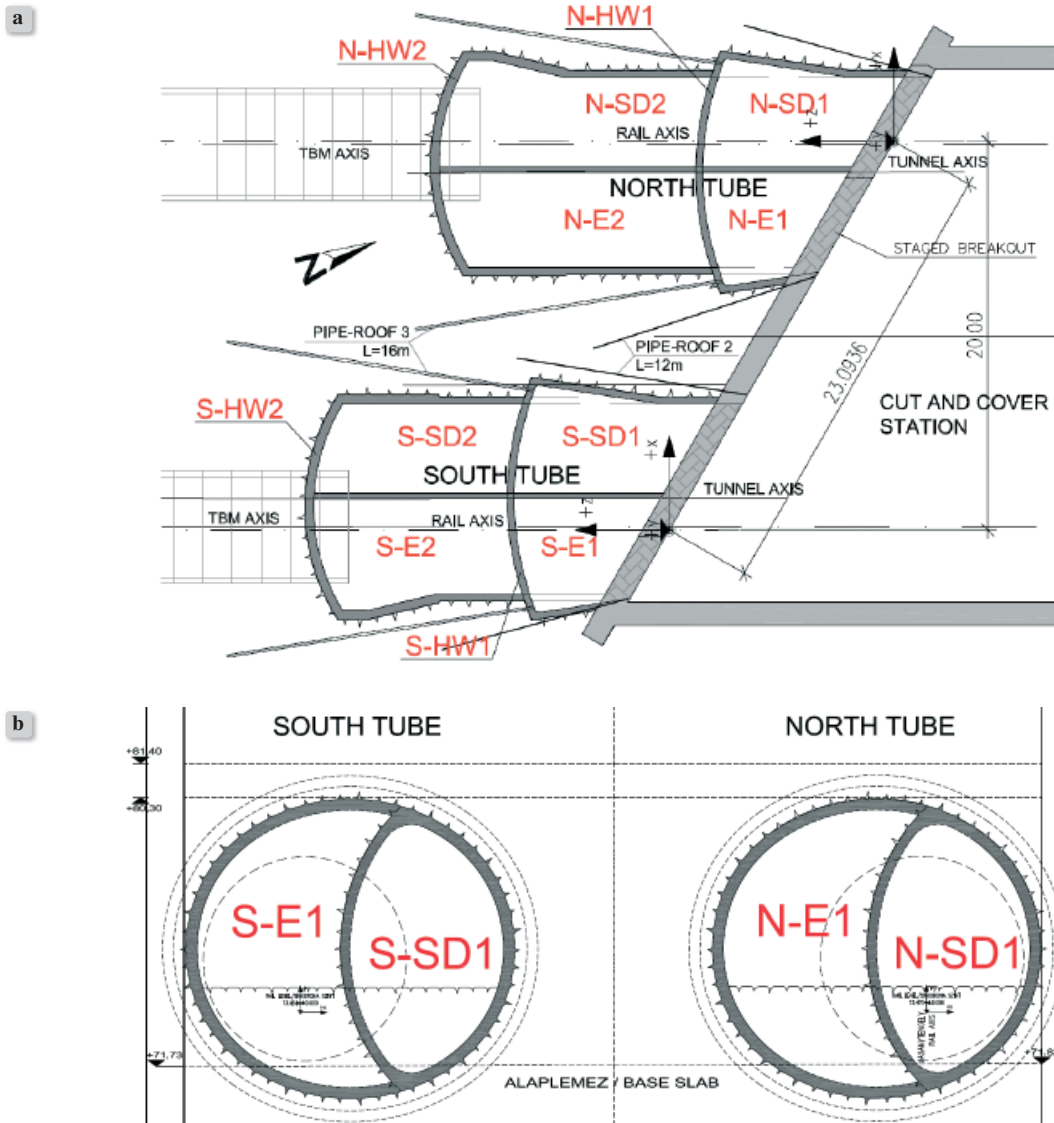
Construction sequence of the SCL Tunnels: a) View of the construction sequence, b) Cross section of the construction sequence [6]
